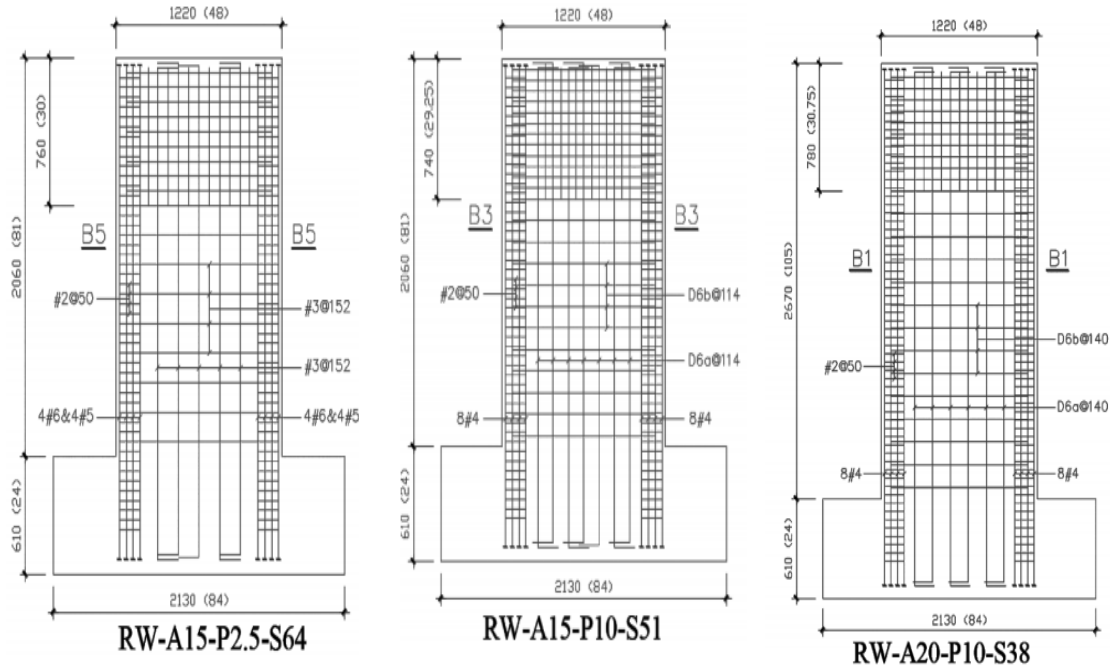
Dimensions and reinforcement details of wall specimens. (Units in mm; 1 in=25.4 mm.).
